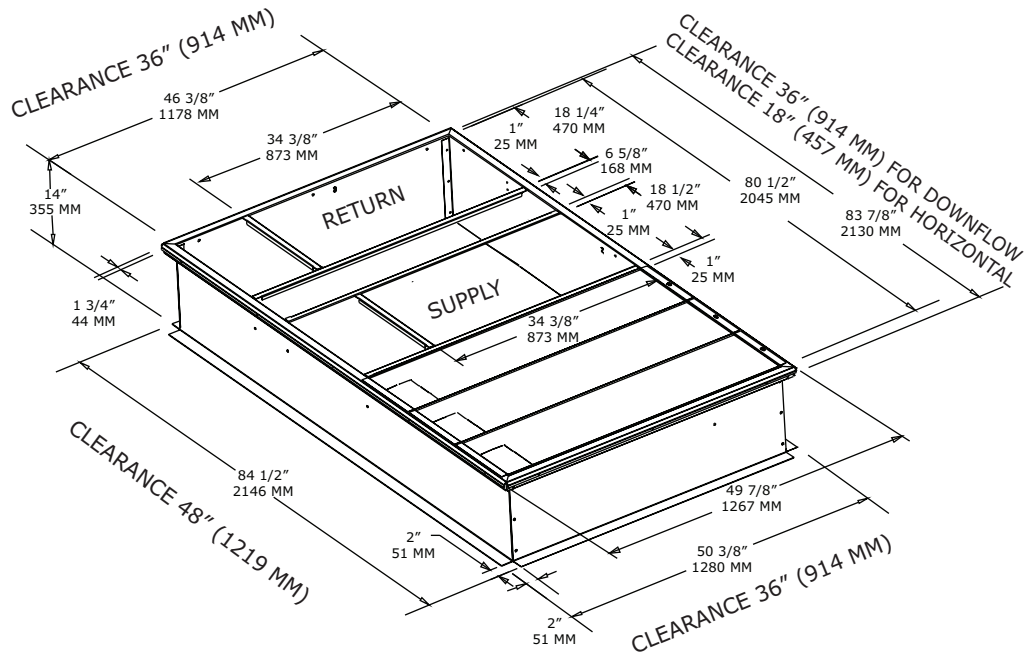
B.0 cabinet – downflow duct connections, field fabricated
